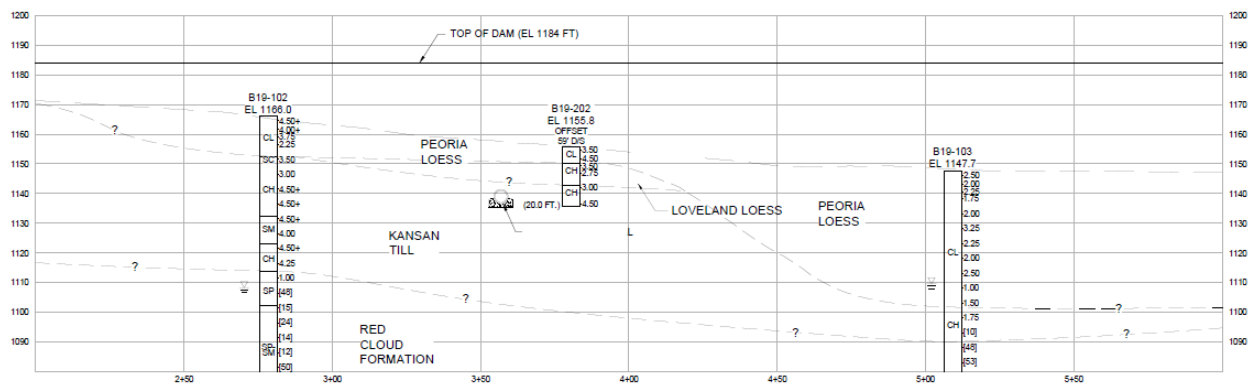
Geologic Profile of the Outlet Works along the Dam Centerline
